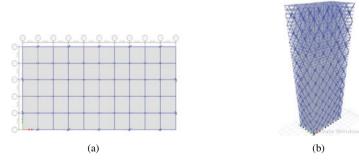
a Plan of the diagrid steel system with damper. b Plan of the diagrid steel system with damper
